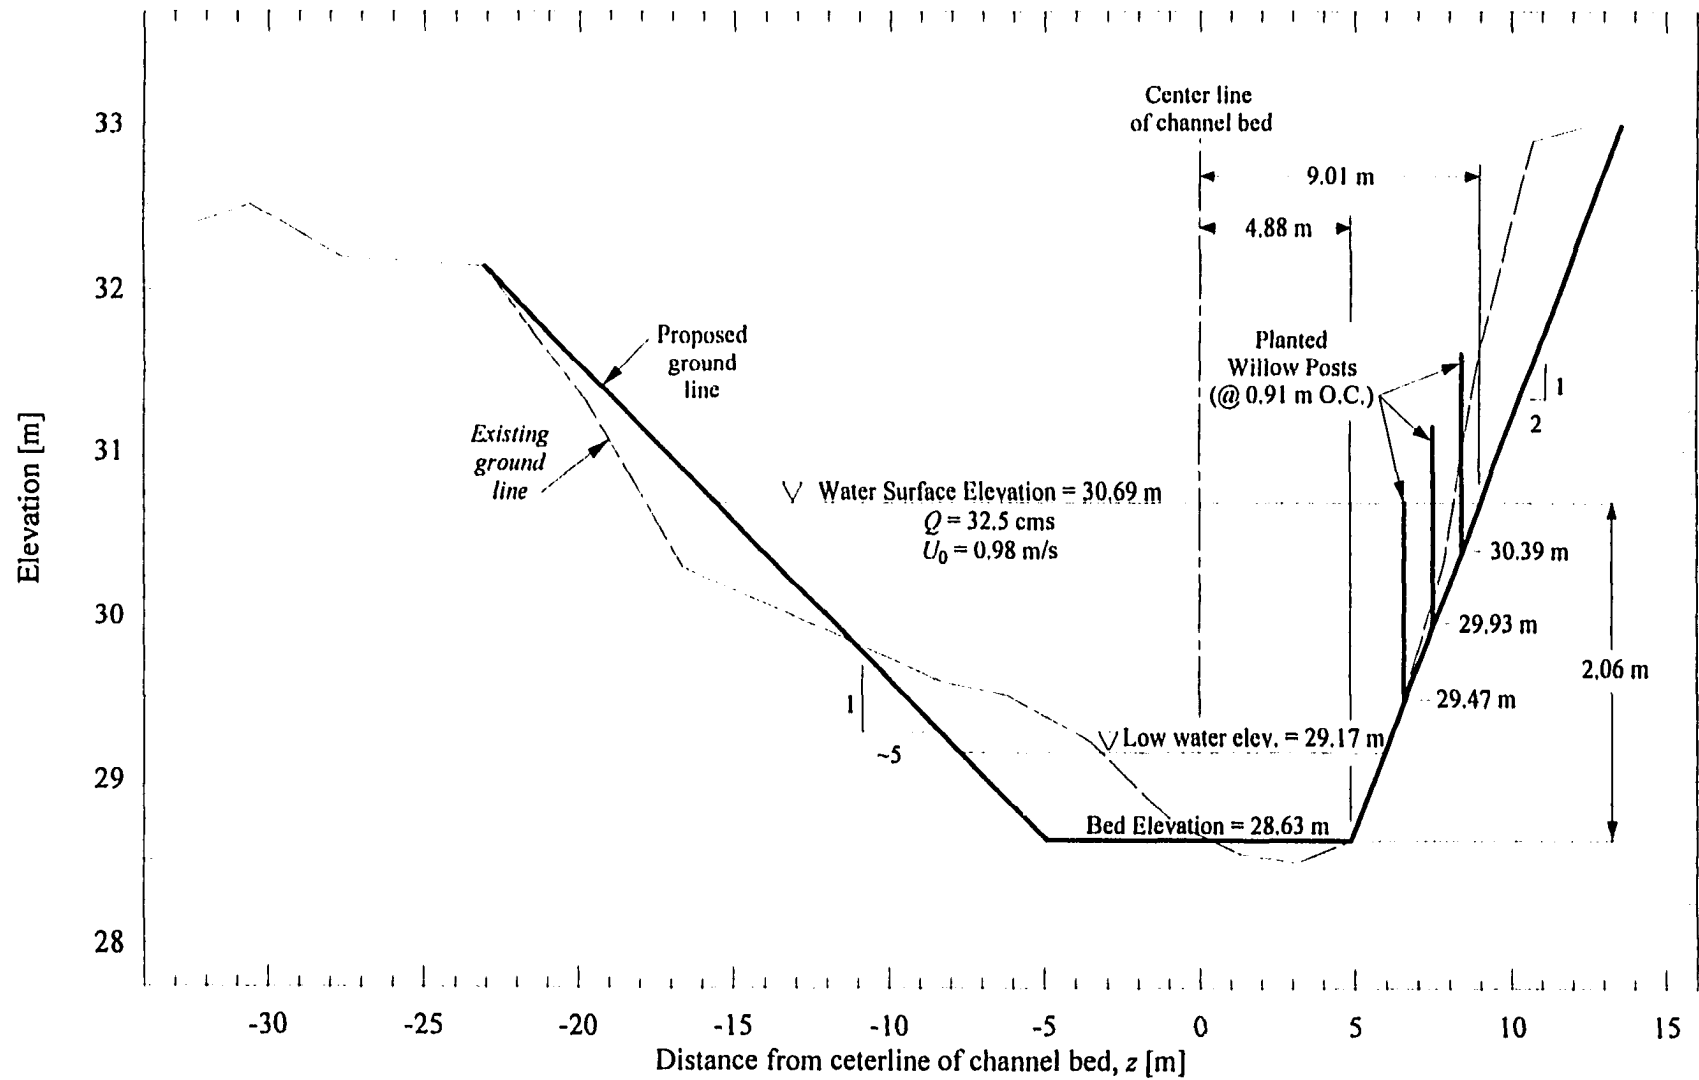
Existing cross-section at Harland Creek with hypothetical proposed cross-section geometry.
